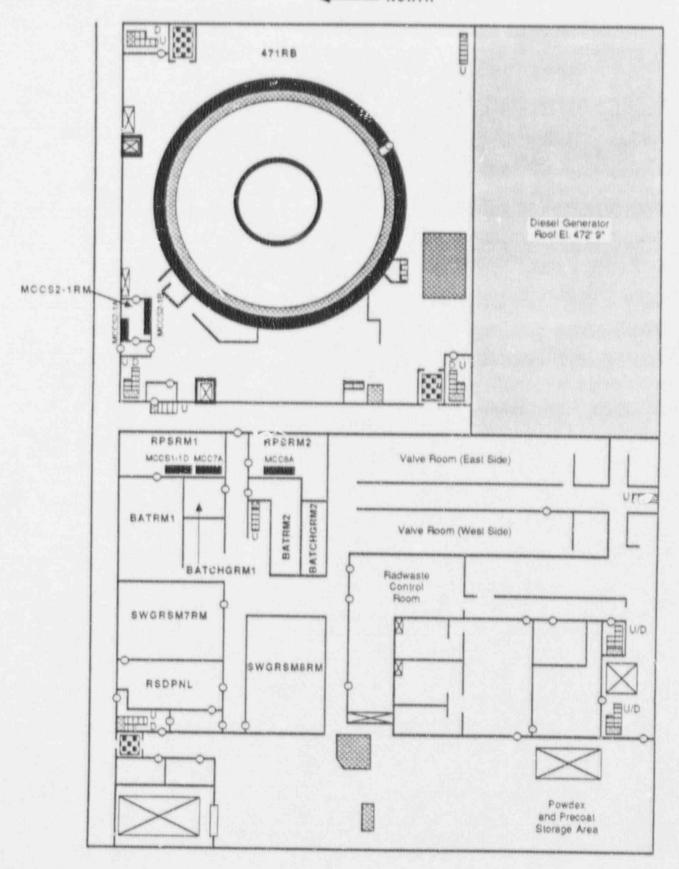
WNP-2 Reactor Building Elevation 471'0" and Control and Radwaste Buildings Elevation 467'0"
